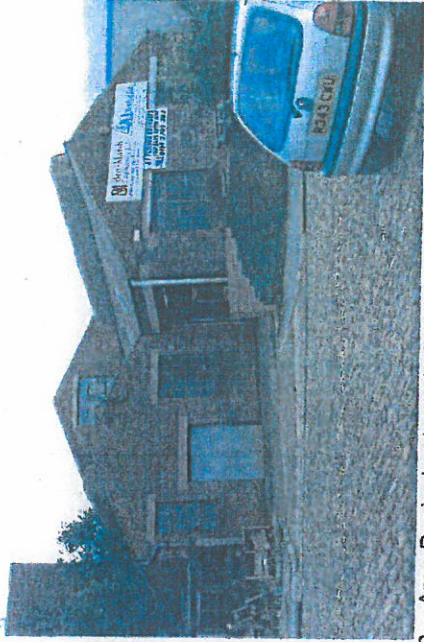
Area B, single-storey buildings on Broad Lane, viewed facing N
